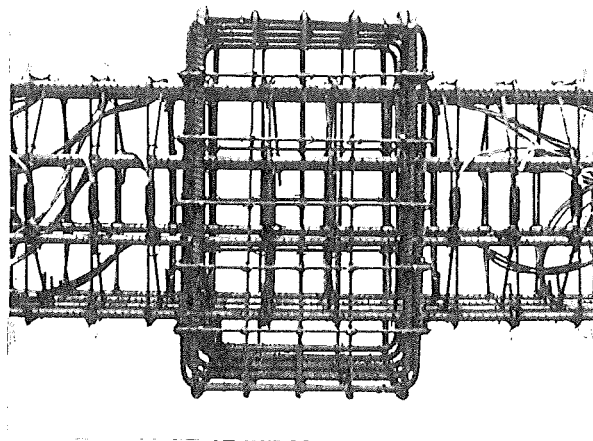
THE ARRANGEMENT OF REINFORCEMENT IN THE CENTRAL STUB
